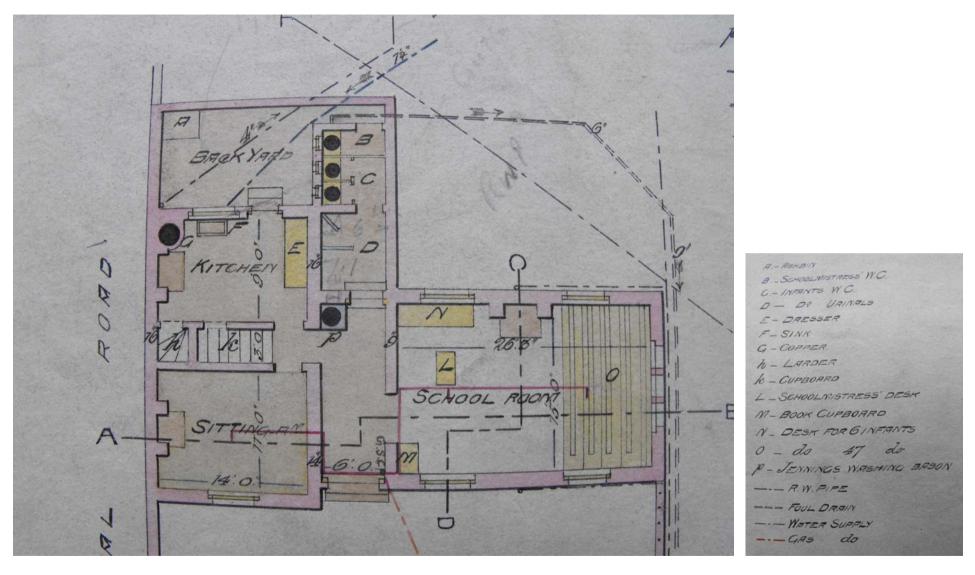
Combermere Barracks, Windsor - Architects plan of 1868, showing the footprint and detail of the schoolhouse (courtesy of the Cavalry museum archive)
